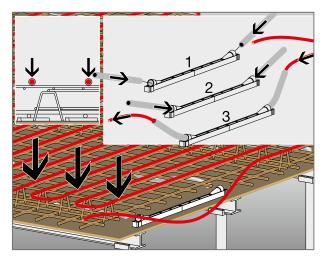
Installation of the circuits according to project planning and leading the connection pipes through the floor lead-in.
